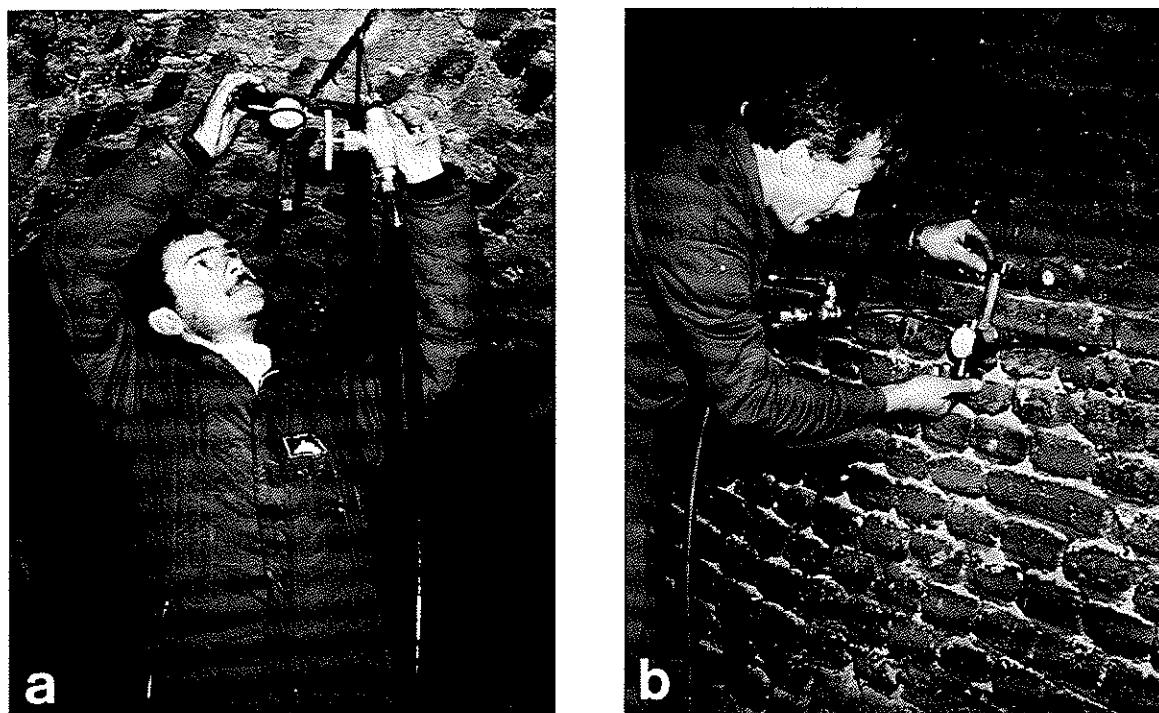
Measurements of stresses in brick masonry linings by the flat jack method. (a) Test made at the roof. (b) Test made at the wall.
